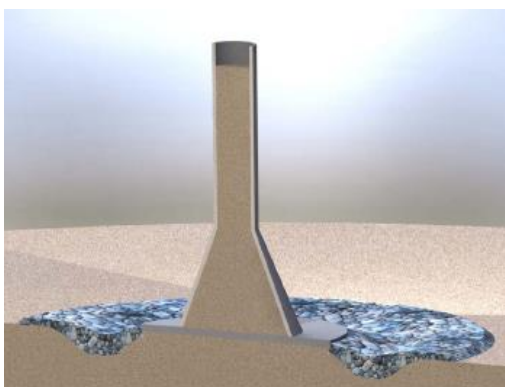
Example on scour protection of a concrete gravity base (drawing: Rambøll).
